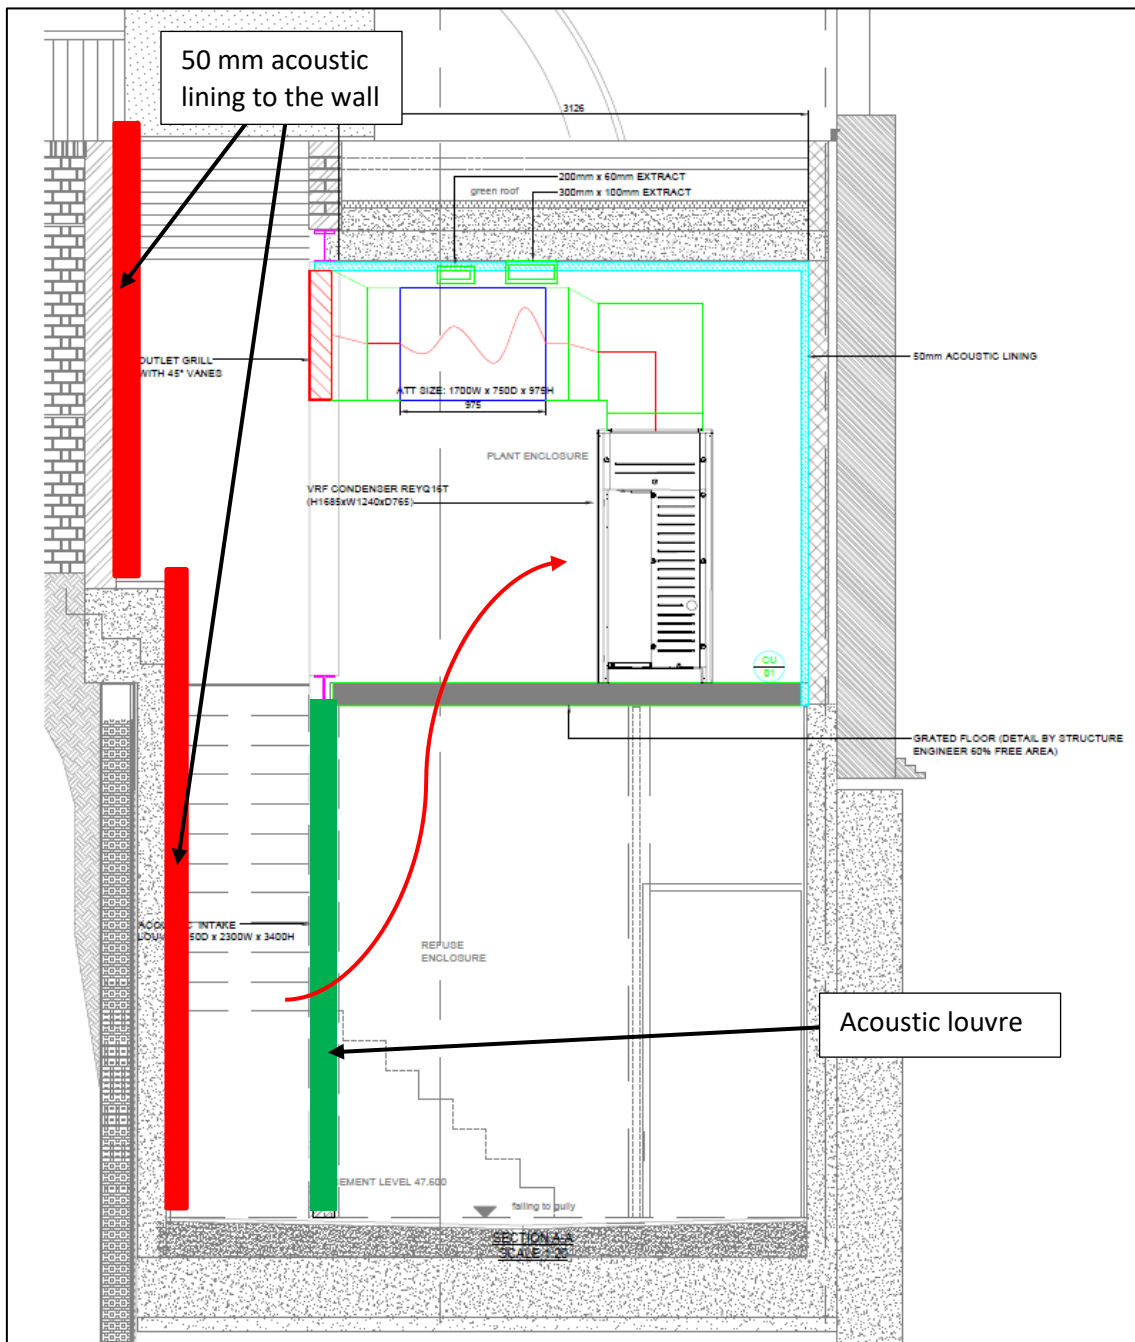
Section through the plant room indicating the air inlet, the acoustic louvre and air discharge route
